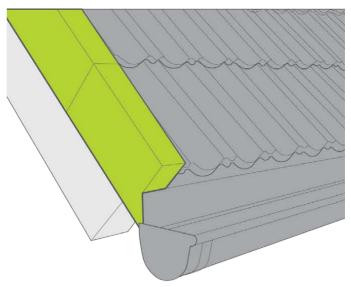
INSTALLING FASCIA BOARDS TYPE 2 WITHOUT BENDING
